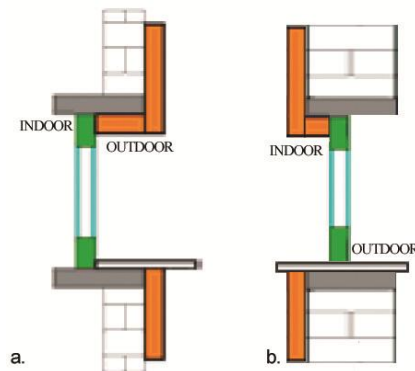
Thermal insulation on existing buildings exterior walls – from outside (a) or inside (b) (Web-1)
